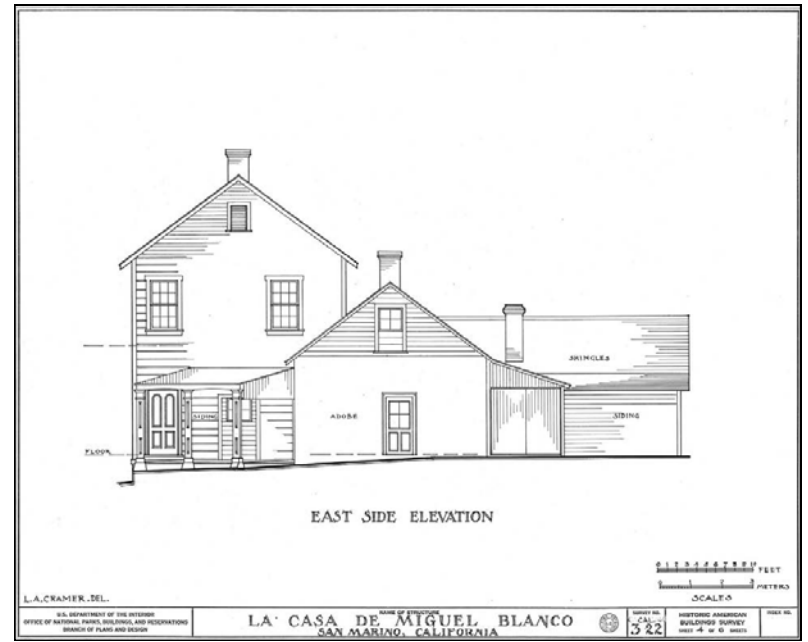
Drawing of "East Side Elevation" (Historic American Building Survey, 1936)
